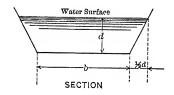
(Part 2 of 3).—Hydraulic Elements of Trapezoidal Sections.
